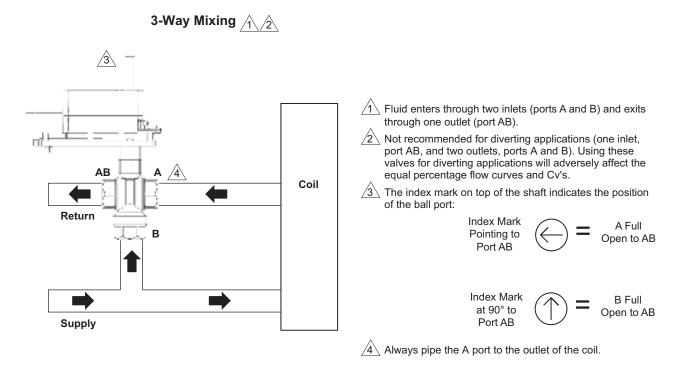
3-Way Mixing Valve Assemblies Piping Diagram.
